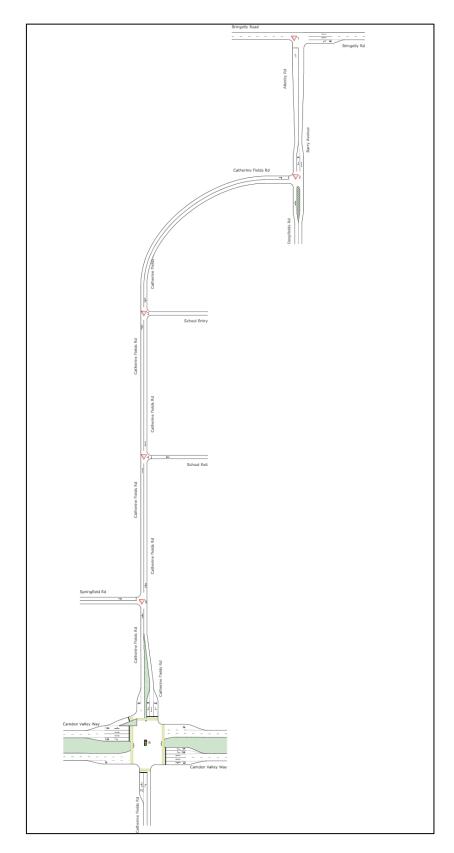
Existing intersection layout as modelled in SIDRA Intersection 9
